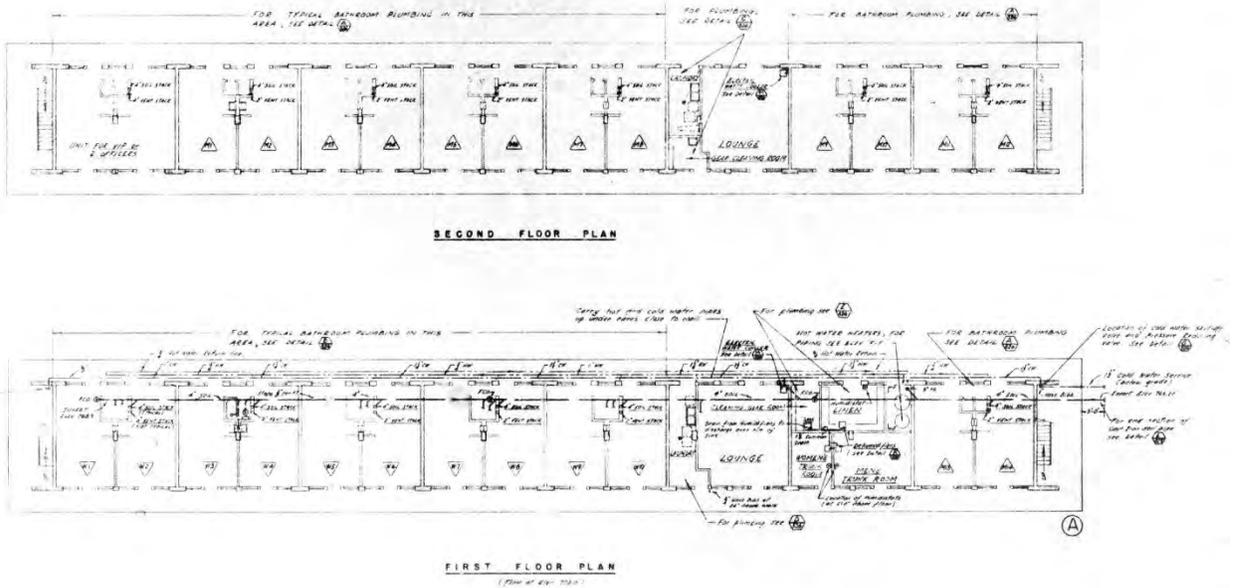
As Built first and second floor plan views of the Bachelors Officers Quarters (Feature 127).
